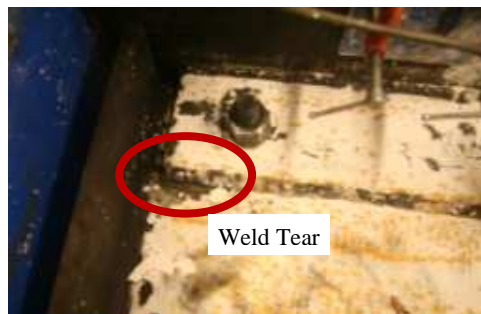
W1 in South Beam-to-Shear Tab Weld
